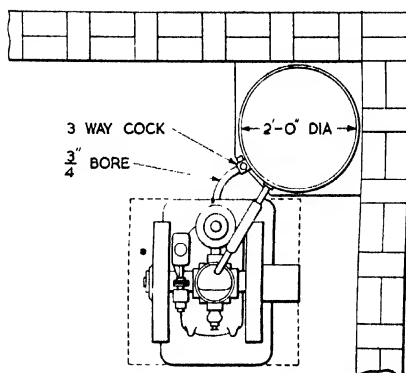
PLAN OF TYPICAL PETROL-ENGINE INSTALLATION
